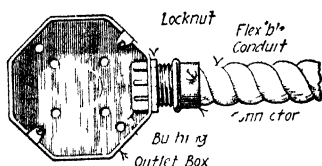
Showing connection of flexible conduit to an outlet box, using a bushing and locknut on the connector.
